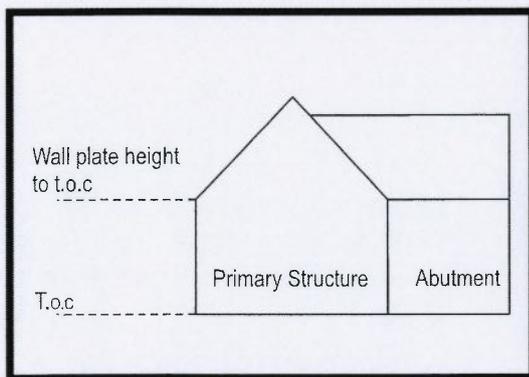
Wall plate height of a single story primary structure and abutment with pitch roofs
